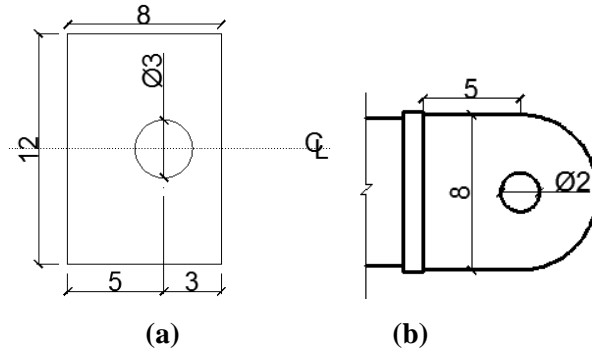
(a) Gusset plate dimensions; (b) BRB-2's end plate dimensions
